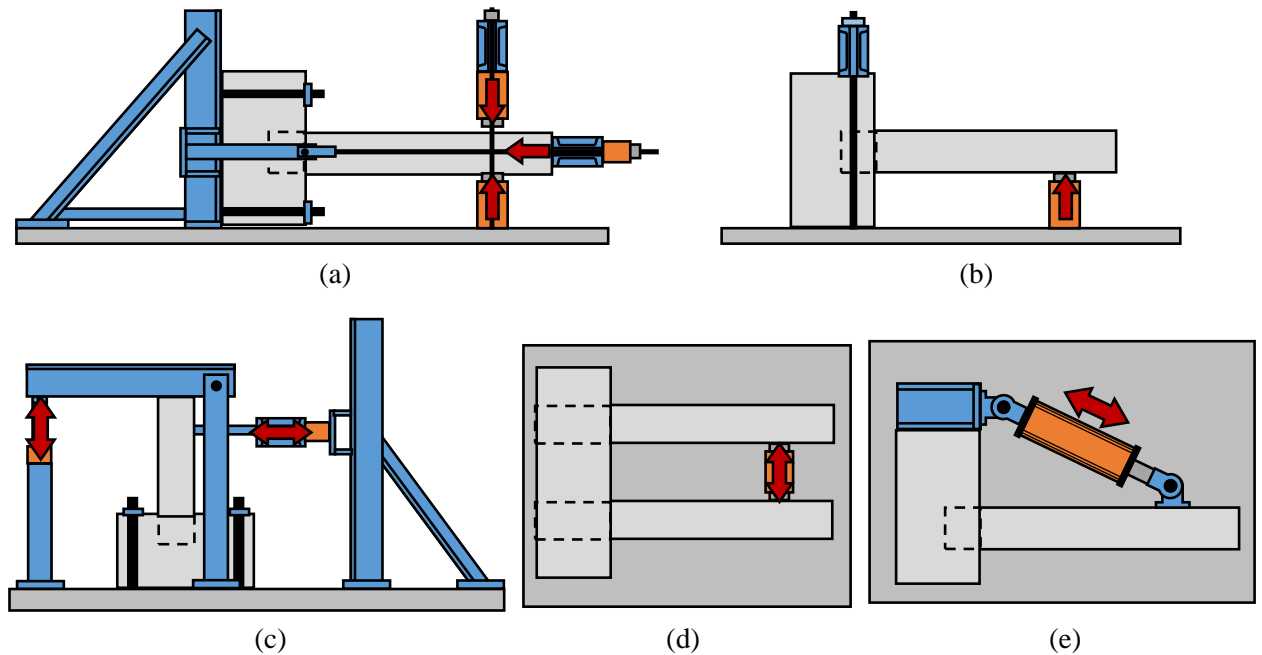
Test setups from previous research (a) Harries and Petrou [6] (elevation), (b) Shahawy and Issa [17] (elevation), (c) Xiao [47] (elevation), (d) Issa [13] (plan), (e) Larosche et al. [15] (plan)
